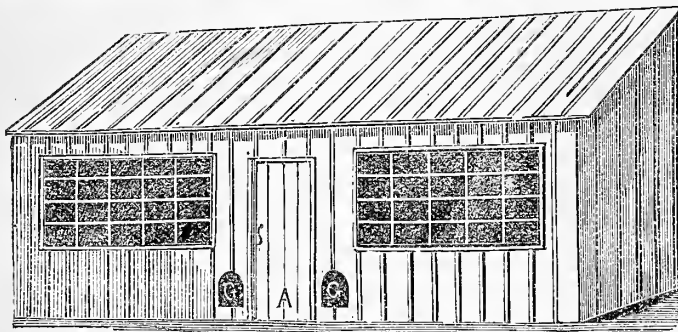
FRONT VIEW OF POULTRY HOUSE.
